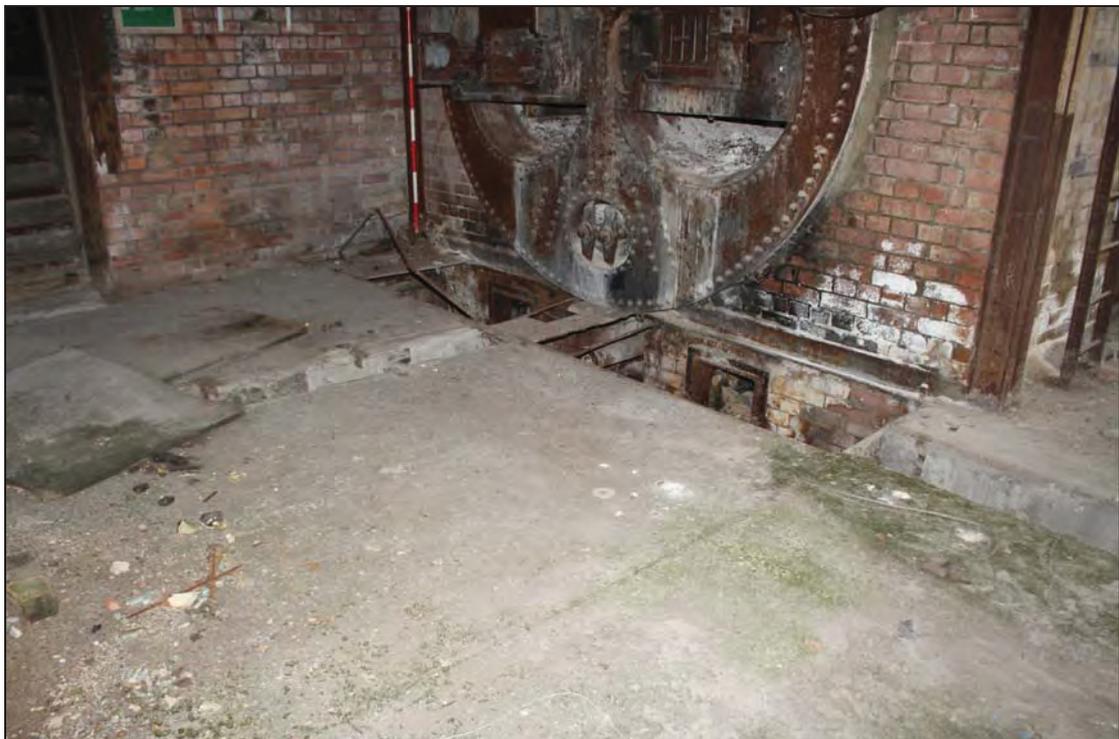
Ducts in the floor and inspections hatches to beneath the boiler, taken from the north-east (17)
